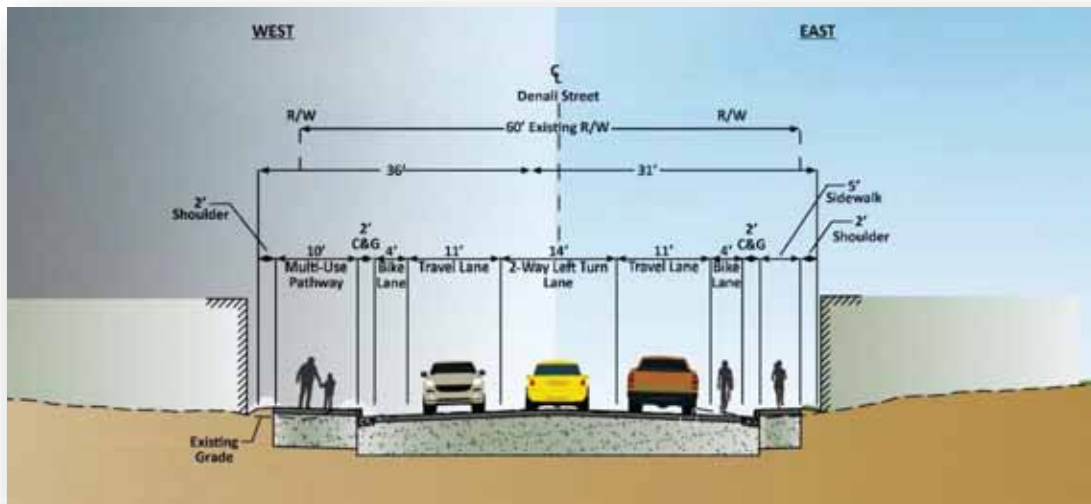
Denali Street (Northern Lights Boulevard to Fireweed Lane) – Alternative 1
